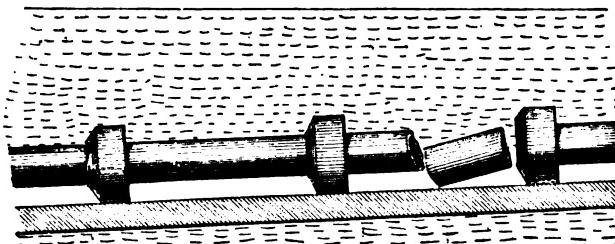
Drain sockets resting on foundation; drain pipe unsupported.
